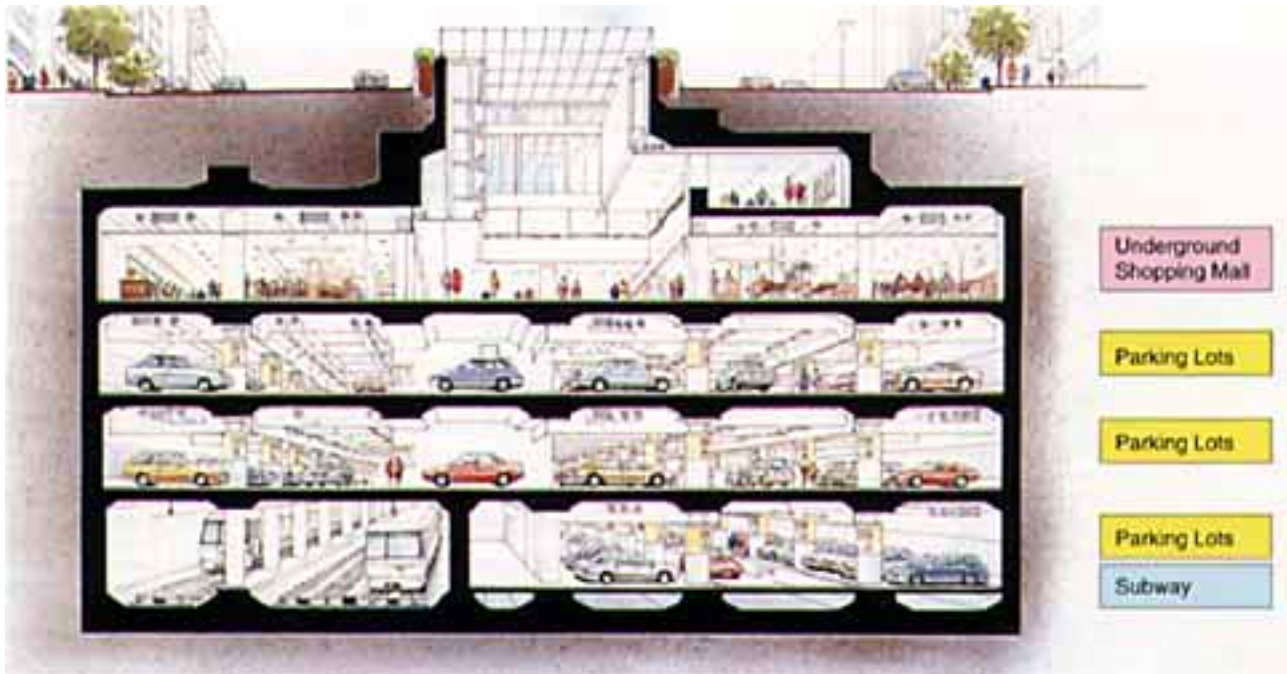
Cross Section of Nagahori Street Underground Facilities
